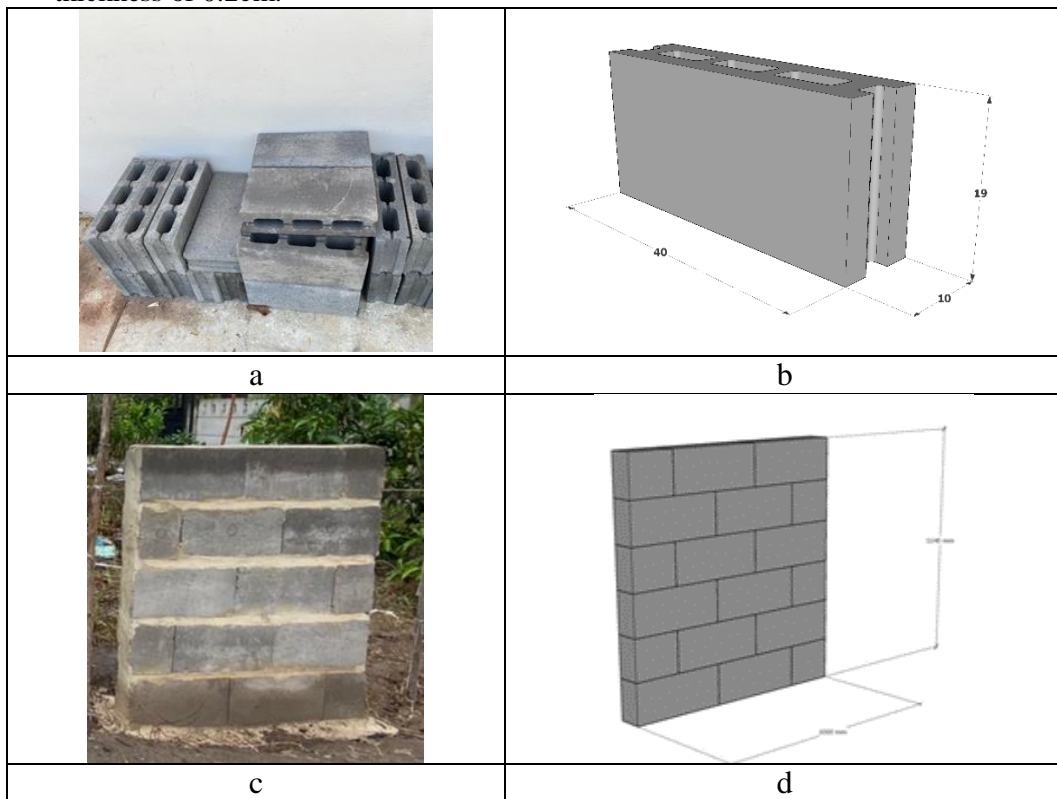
(a,b) Object and dimension sketch of FABA brick unit and (c,d) Illustration of FABA brick wall construction
